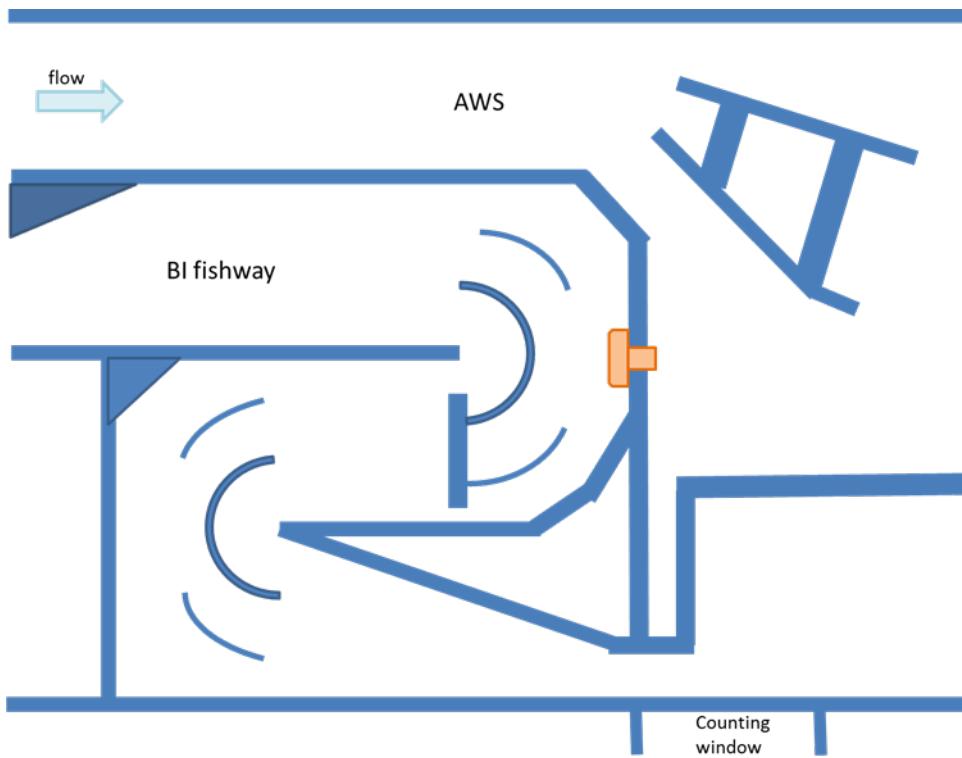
Schematic of a section of the Bradford Island Fish Ladder showing approximate potential location (orange) of the proposed wetted wall lamprey climbing structure allowing passage from the base of the serpentine weir section into the adjacent MUWS (AWS) channel.
